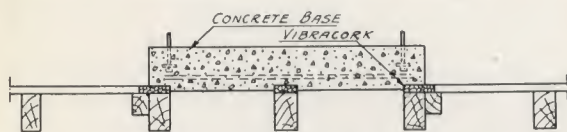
FOUNDATION—MILL TYPE FLOOR CONSTRUCTION
